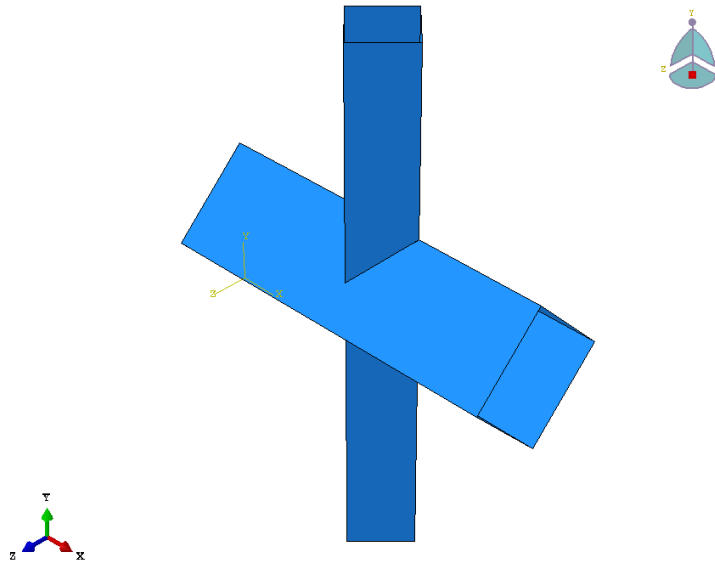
Assembly and merge procedure of the joint (Assembly module)
